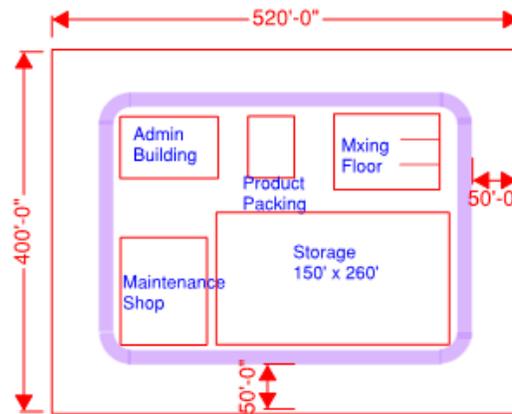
Conceptual site layout of offsite area for Alternative 3
